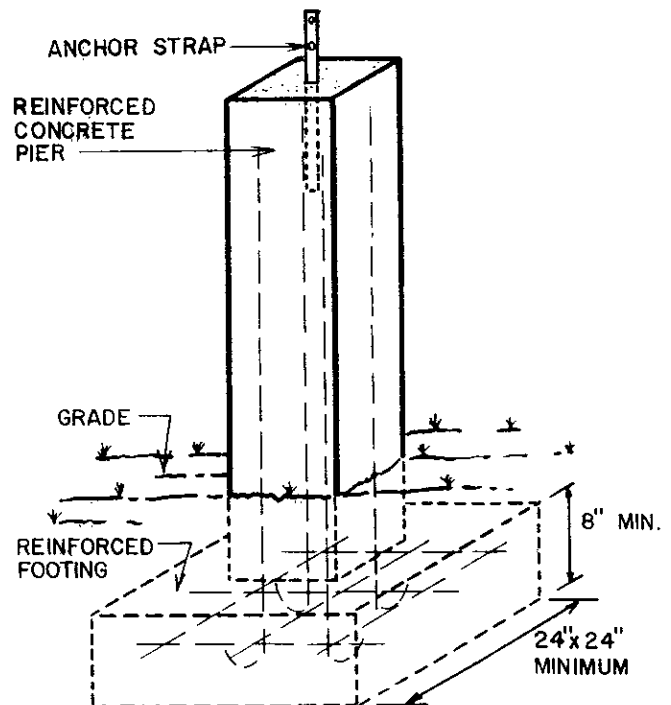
Columns tied to footing with reinforcement. (Reference 7)
